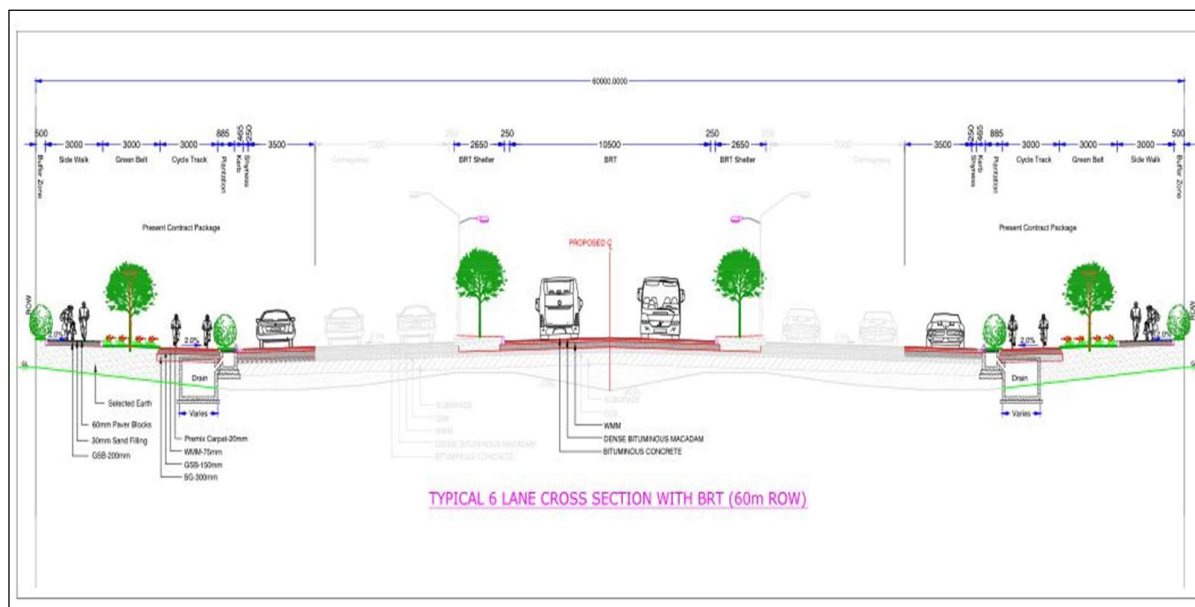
PROPOSED CROSS SECTION OF E3 ROAD
